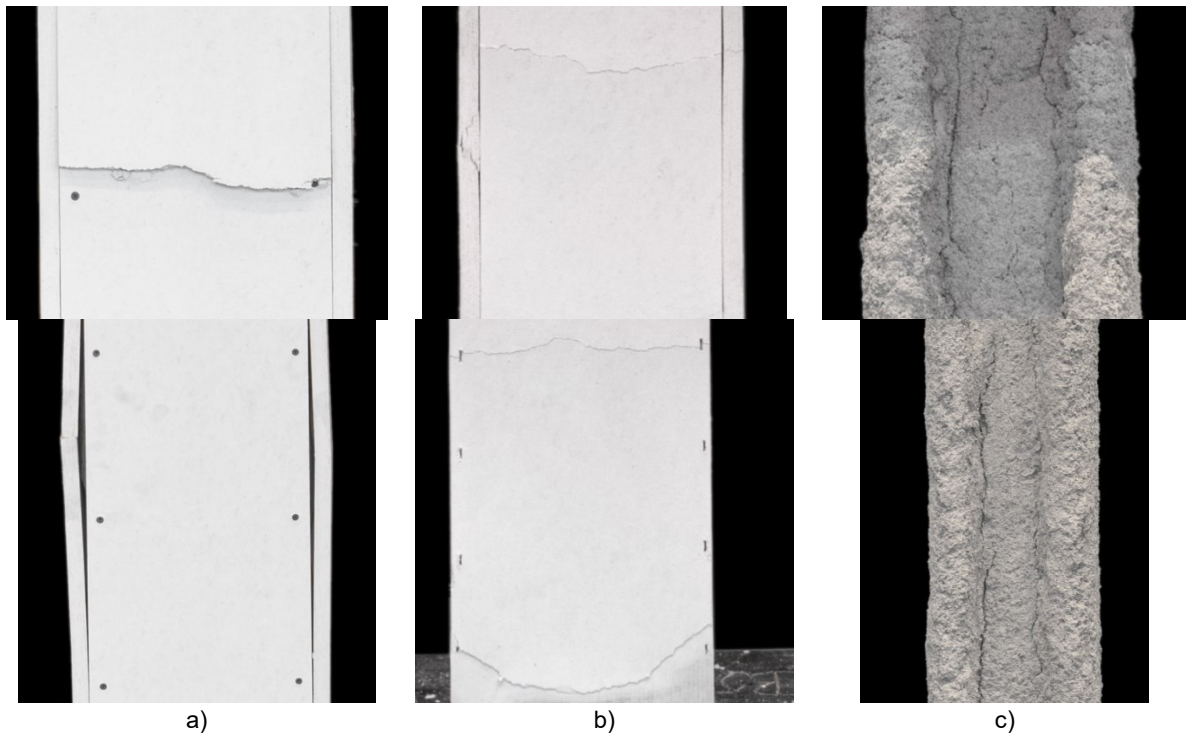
Damage of the fire protection elements due to the combination of seismic and fire actions: a) test #2 column B; b) test #3 column C; c) test #4 column D.
